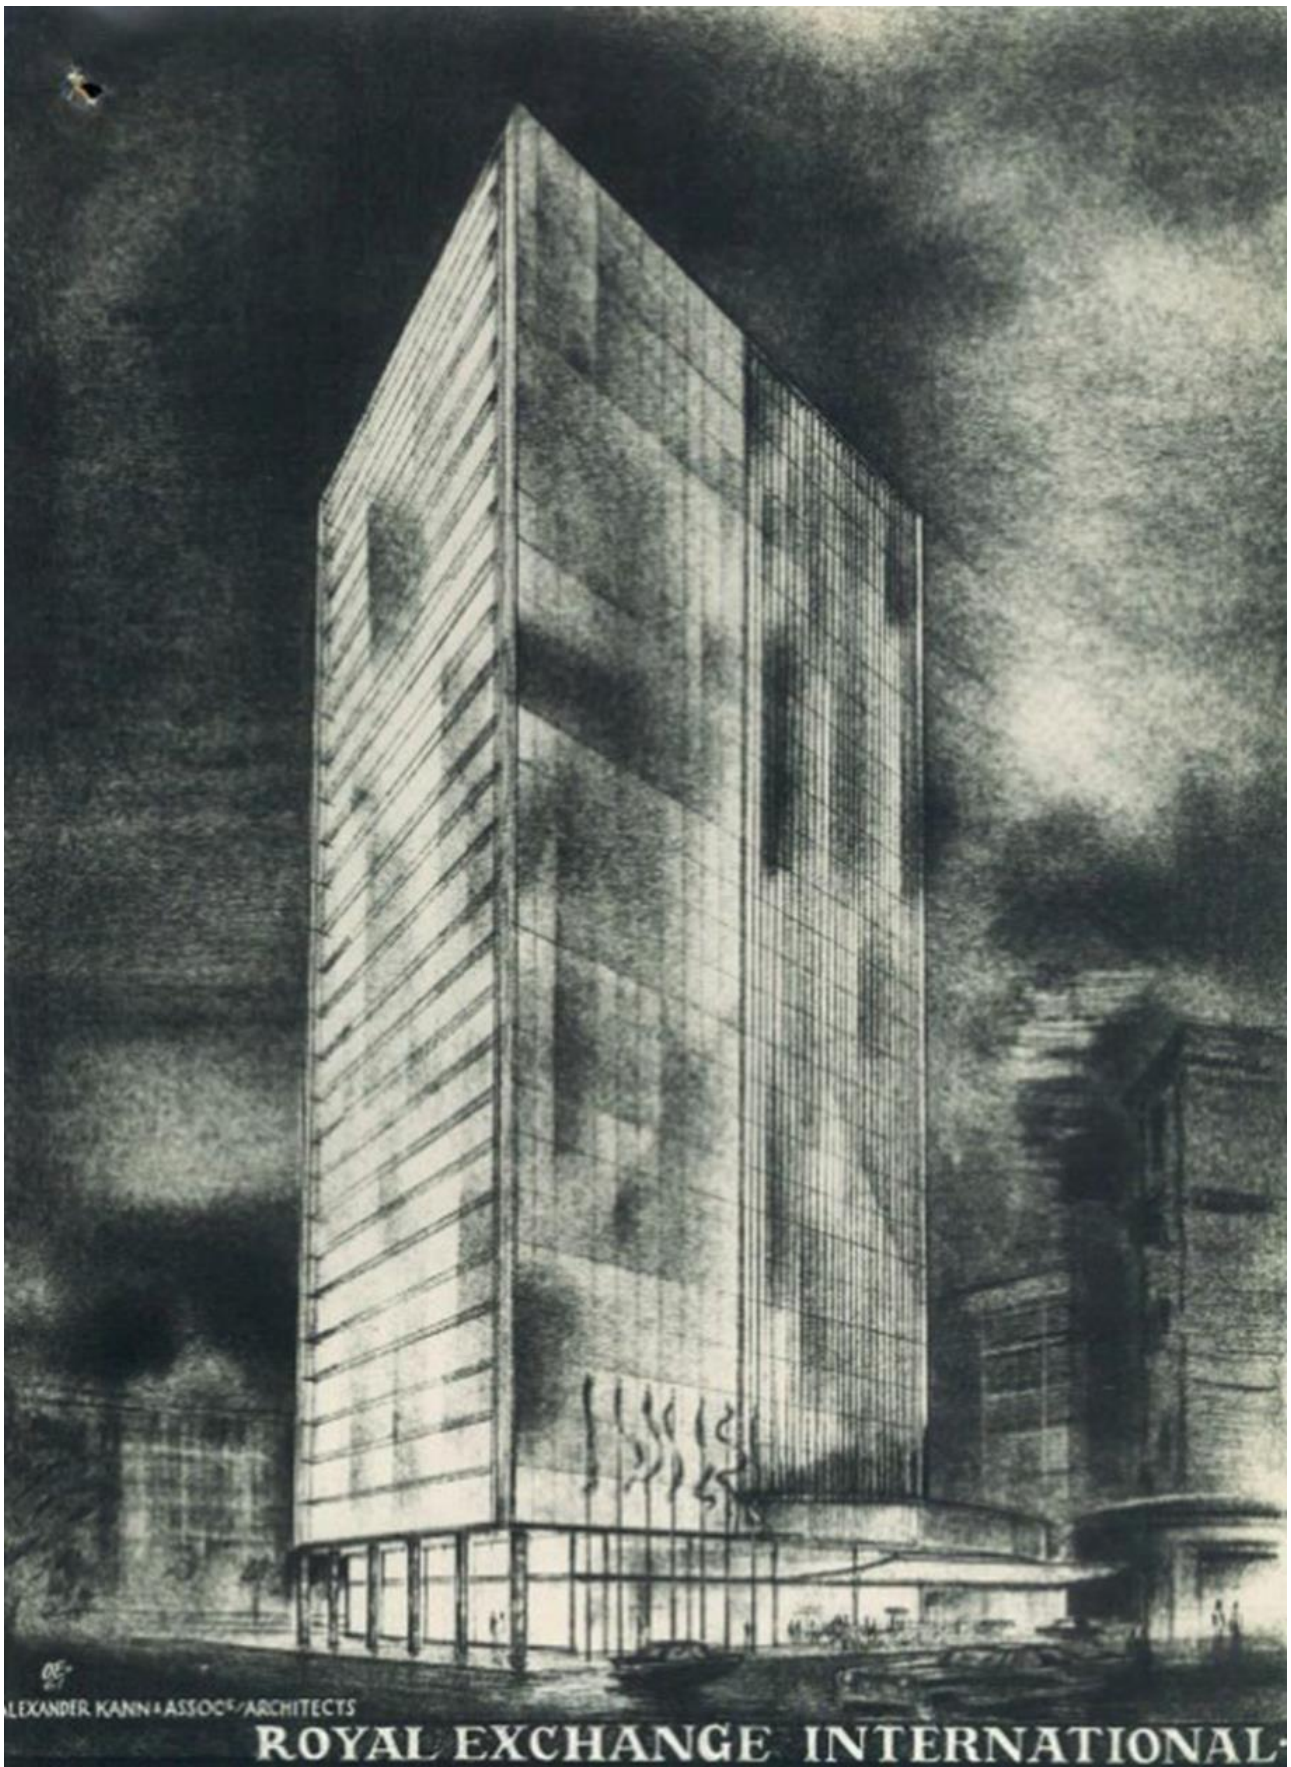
Indicative render of the building at 56 Pitt Street, submitted with the development application.
